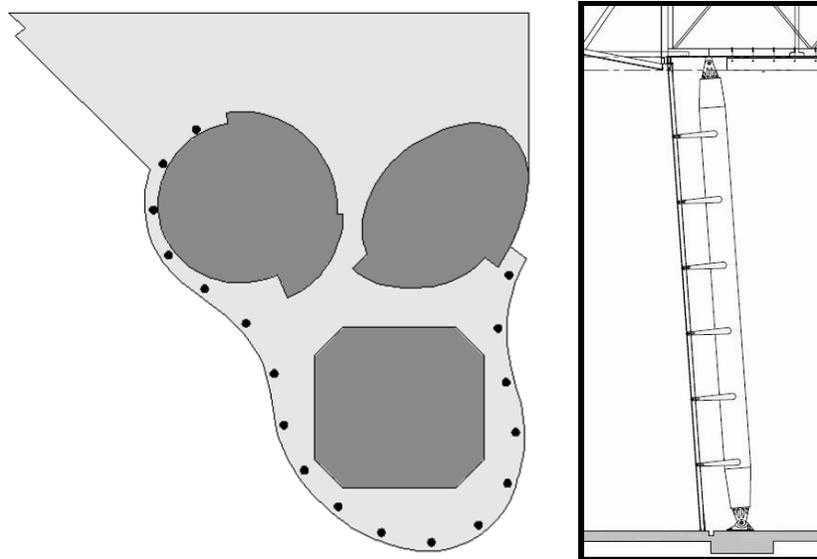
Plan view of the 18 columns (left) & an elevation of a column showing the 6 rows of support arms tying into the glazing (right)
